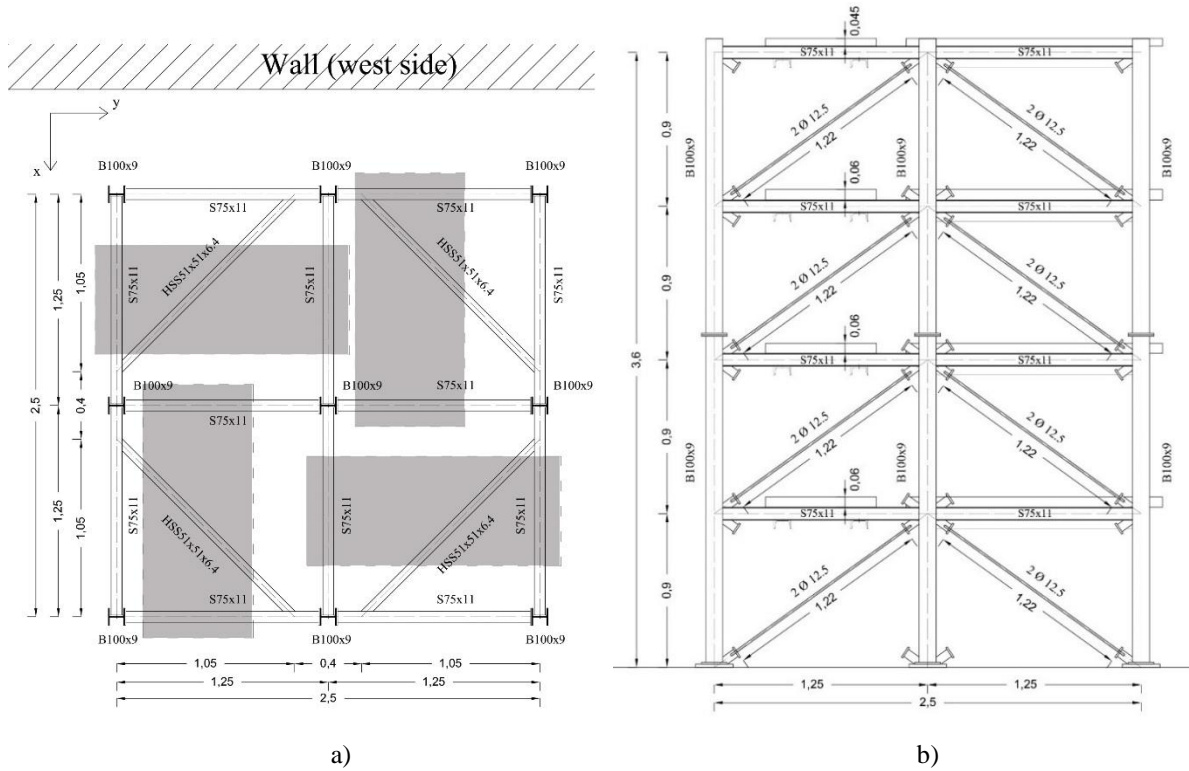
Geometry of the steel frame structure: a) plan view; b) lateral view of the south face
